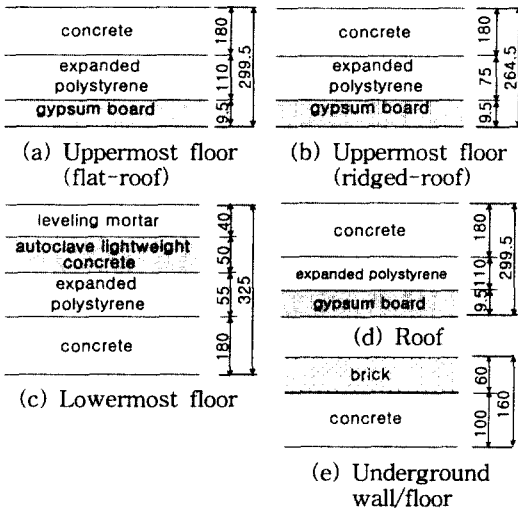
Details of auxiliary floors and wall (unit: mm).
